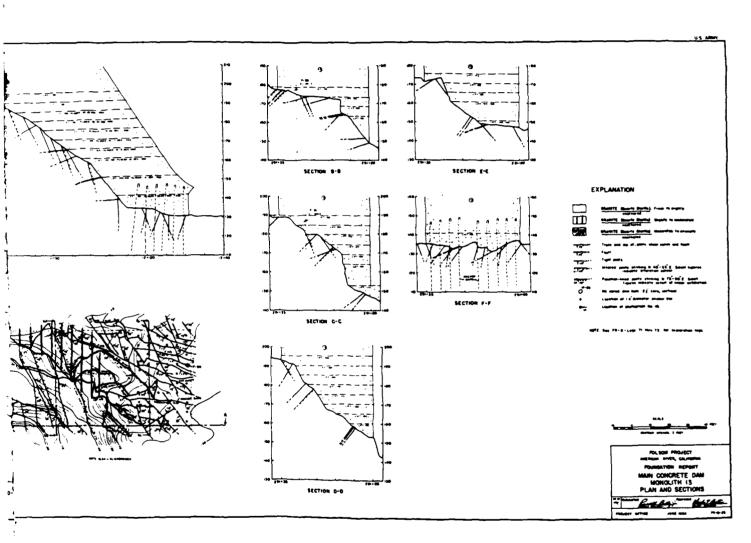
Plan and Sections of Concrete Gravity Dam Monoli
